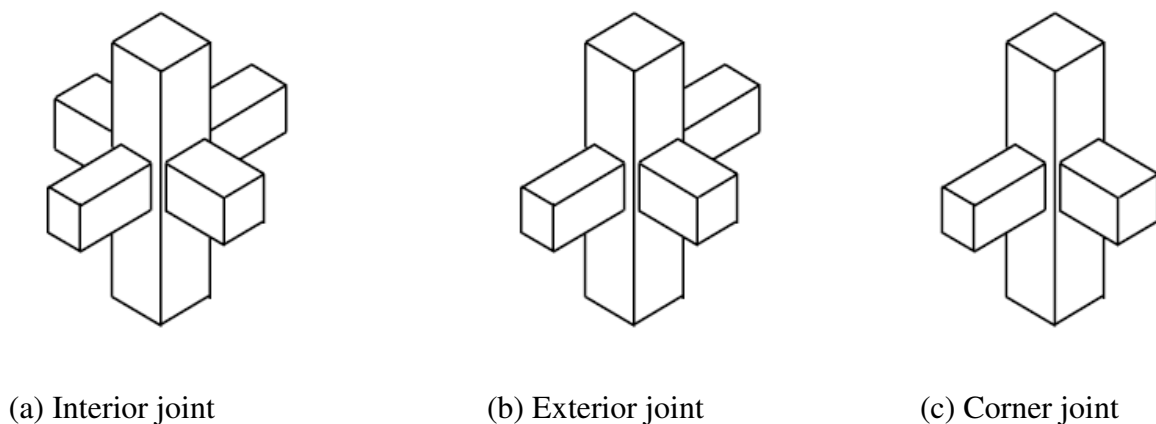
Types of beam-column joints [Uma and Prasad, 2006]
